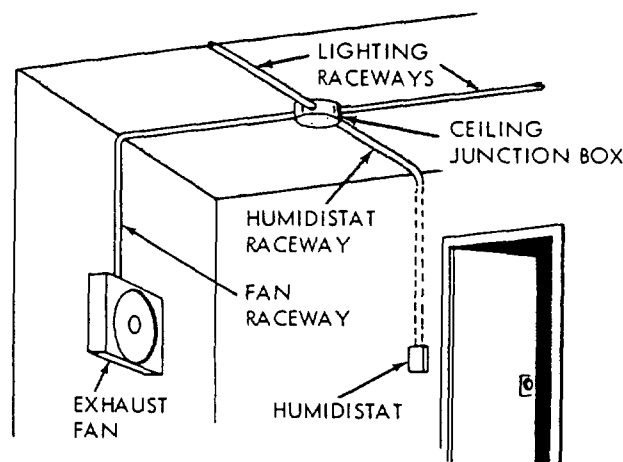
Typical Exhaust Fan/Humidistat Installation
